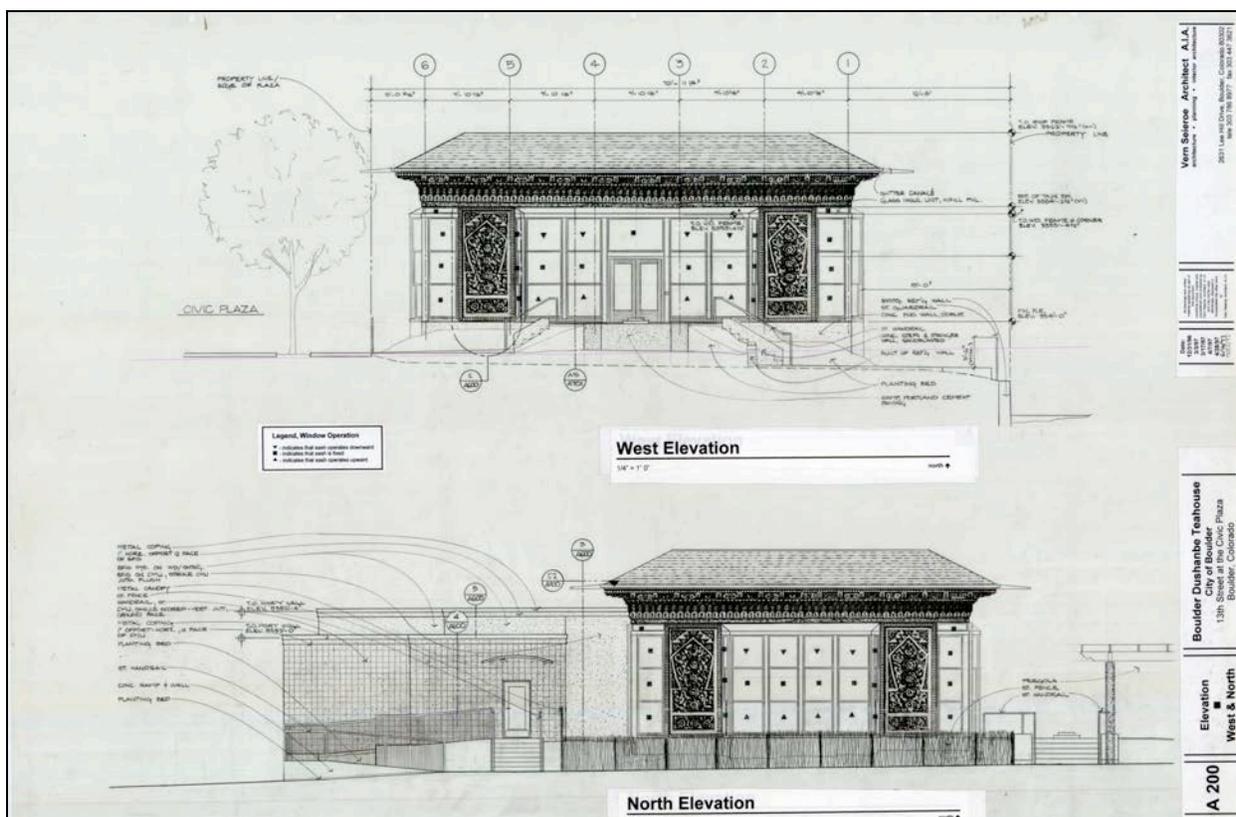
Construction Drawing A200, West and North Elevations, Vern Seieroe, AIA, Architect
